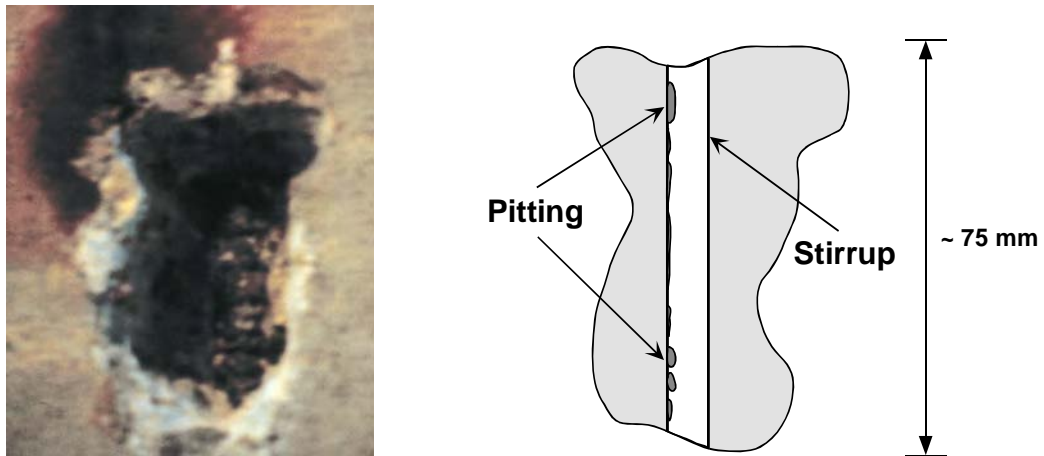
Reinforcing Bar Condition under Crack, Specimen 1.3
